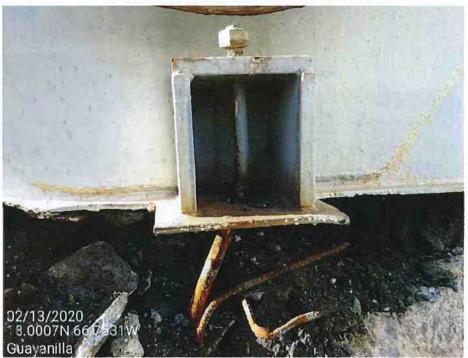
Anchor bolt ripped off from concrete base, due to seismic overturning moment.
